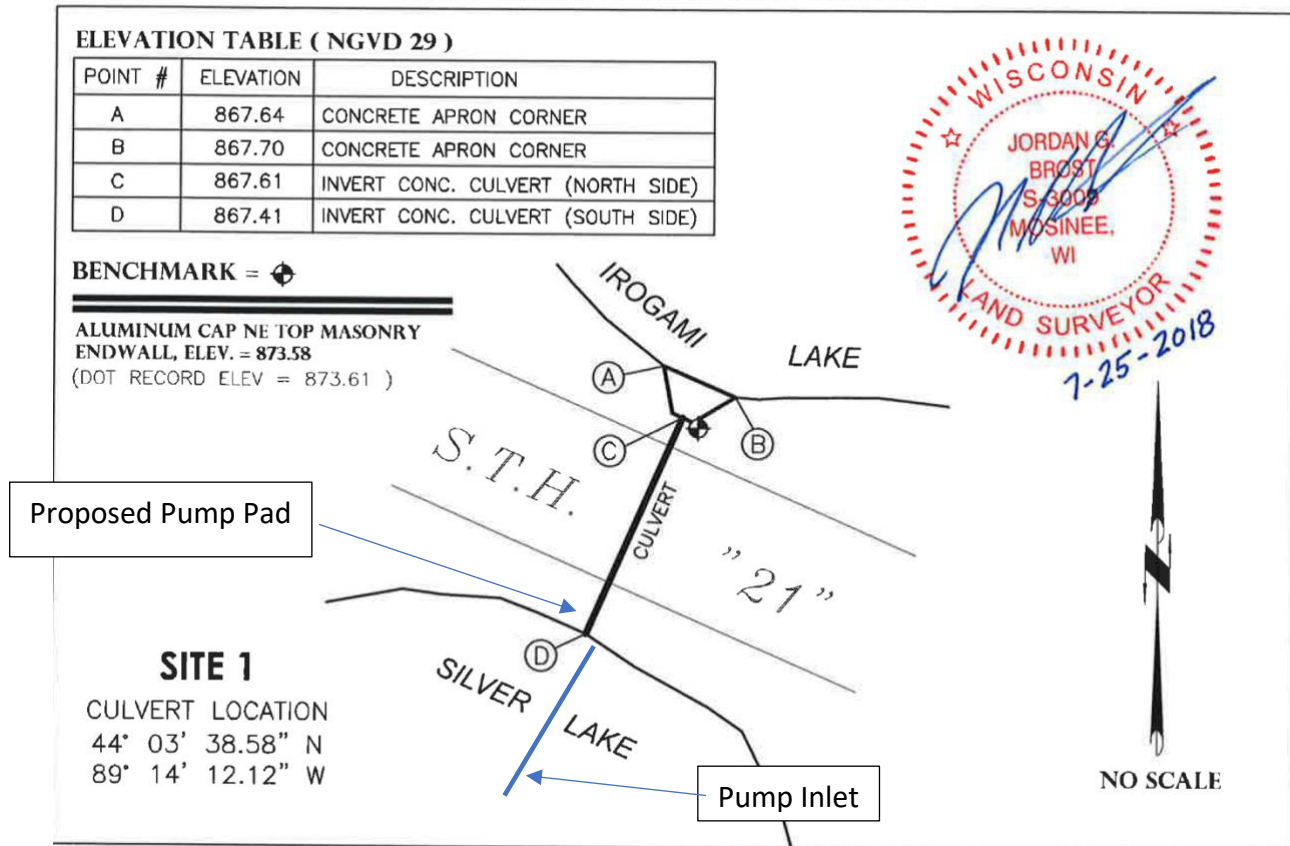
WI DOT State Highway 21 culvert elevations between Silver and Irogami Lakes.
